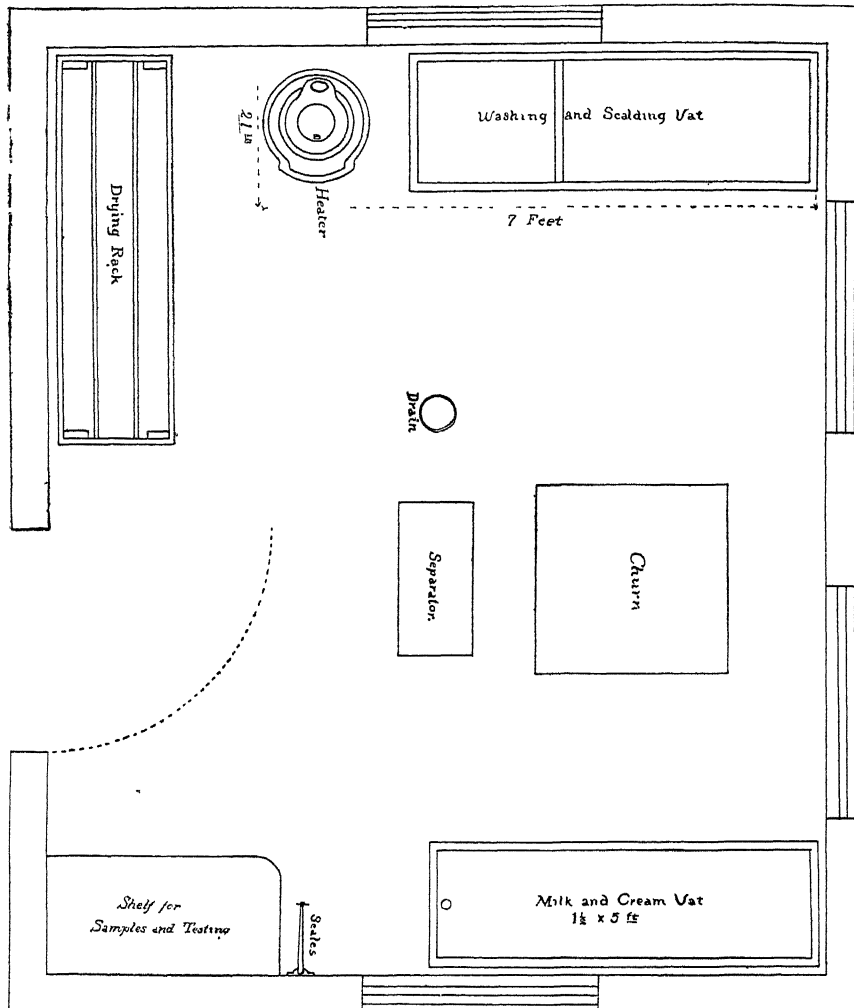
A satisfactory and convenient floor plan for a small dairy house with a floor space 10x12 feet. A cement floor is to be recommended wherever possible. When cream is sold the churn can of course be omitted. If butter is to be made a small, portable table will be needed; also a butter worker, if the churn is not of the combined type. A milk record sheet should be placed on the wall near the scales.
